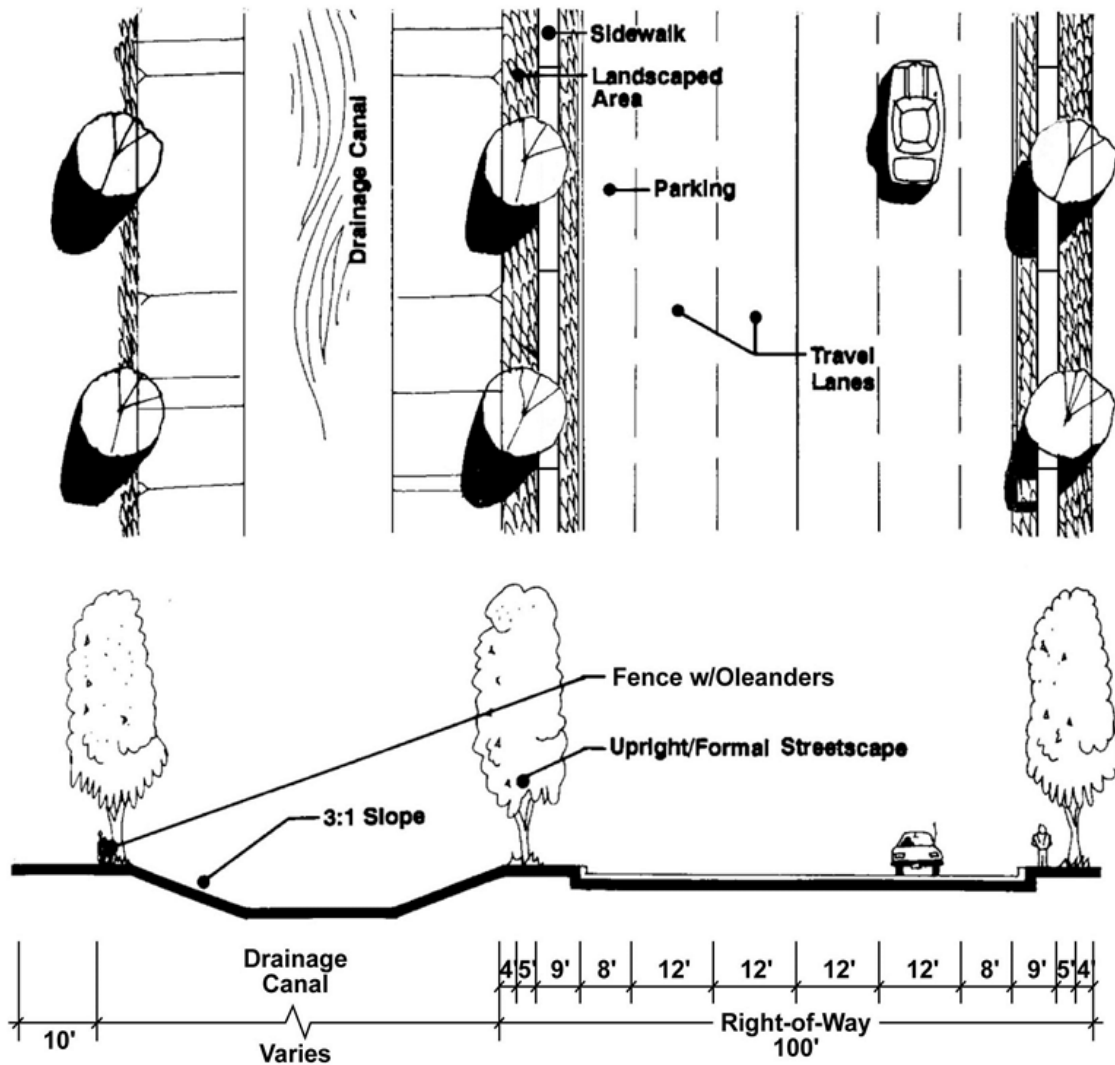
, Secondary Streetscape 1, illustrates the Formal Canopy Streetscape, using upright trees, with a maximum spacing of 35 feet on center to shade the sidewalk area. This streetscape should be used for "C" Street and Tyler Street, north of Avenue 64.
